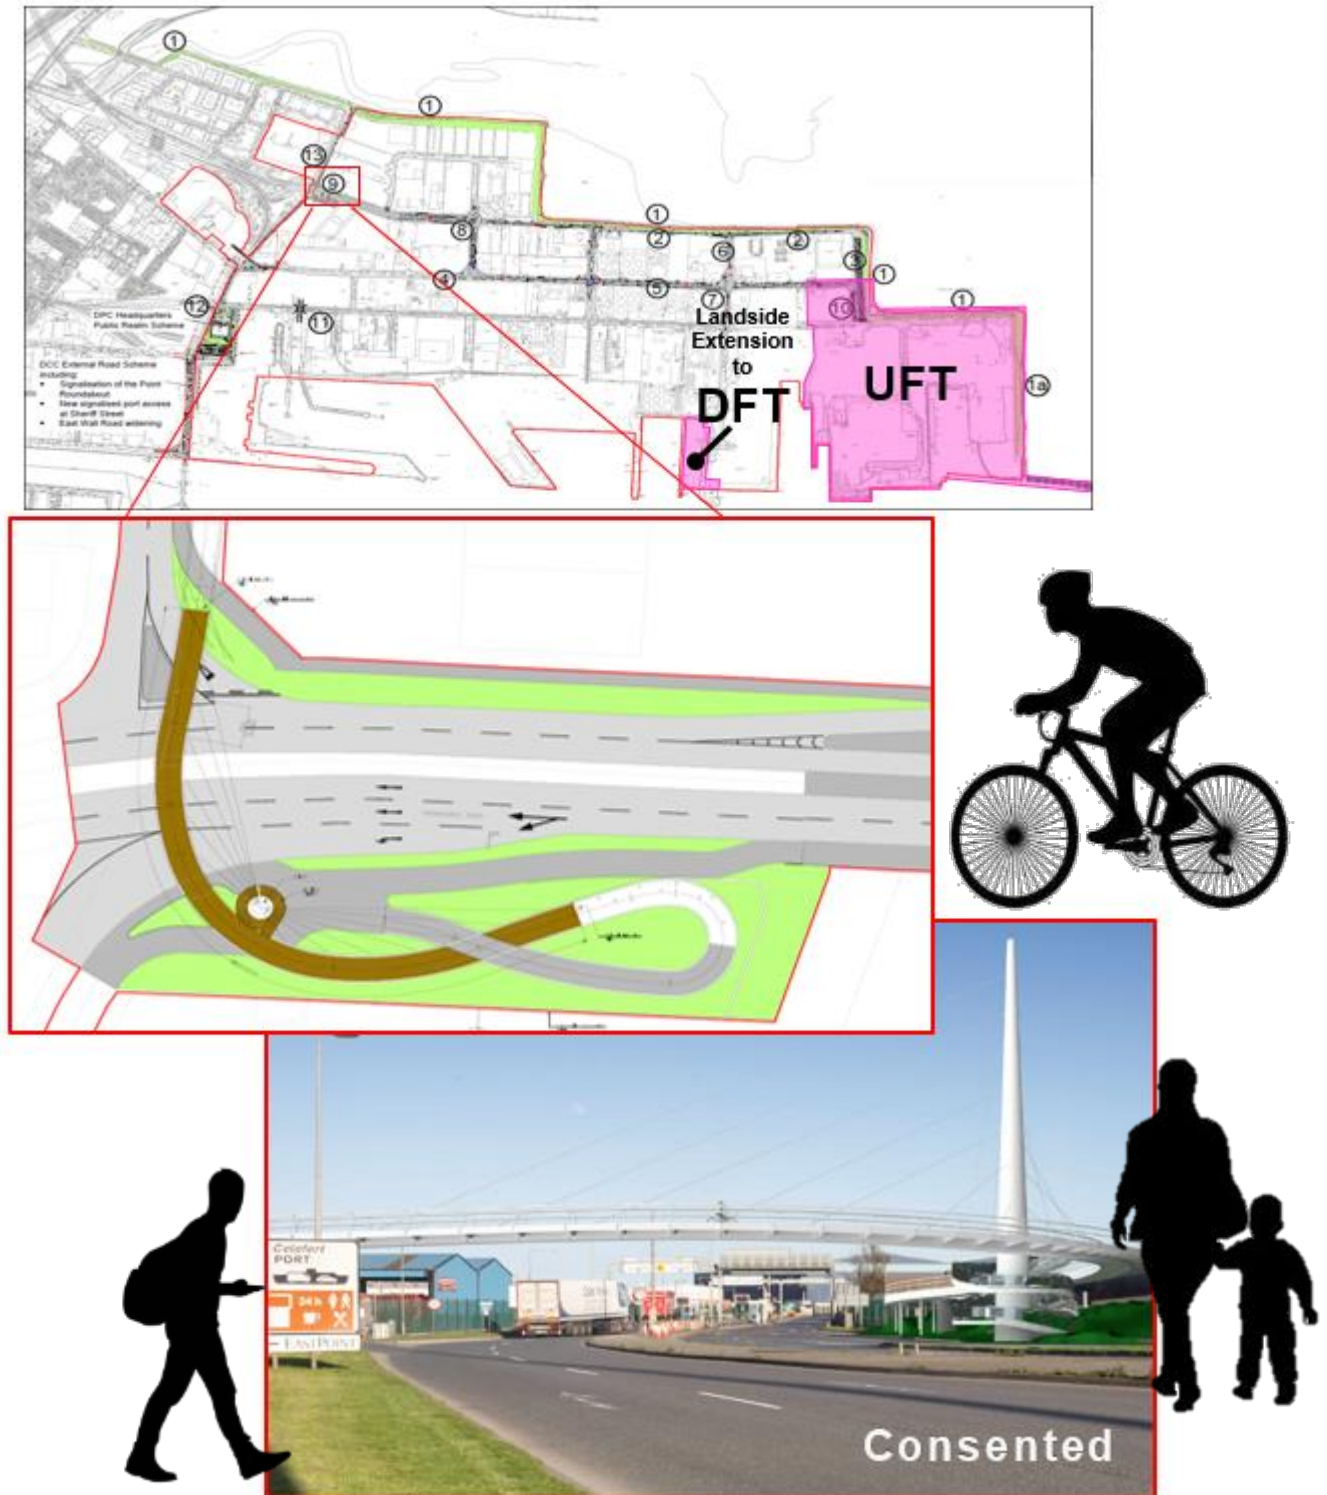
Consented Landmark Bridge Structure to Provide Pedestrian and Cycle Access across Promenade Road
